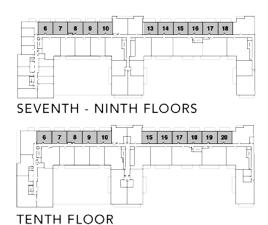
Typical condominium floor plan courtesy of http://www. 550wellington.com/. April 2009.
